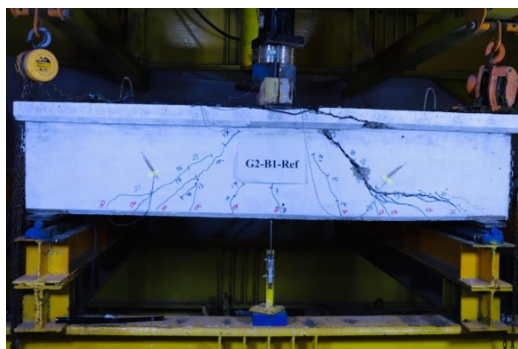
Failure crack pattern of specimen G2-B1-REF.
